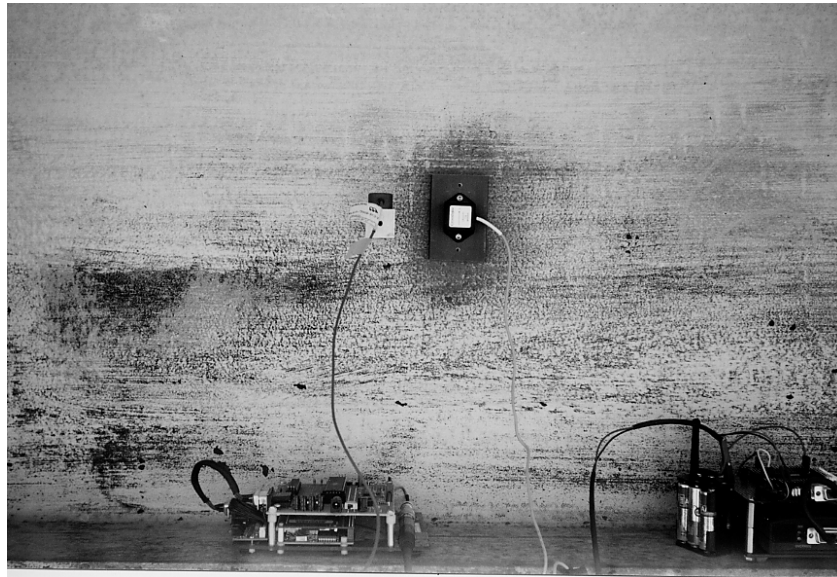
PCB336 (left) and CXL01LF1 (right) accelerometers at S6
